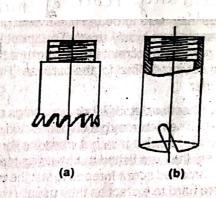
(a) Toothed Cutter (b) Chilled-shot
